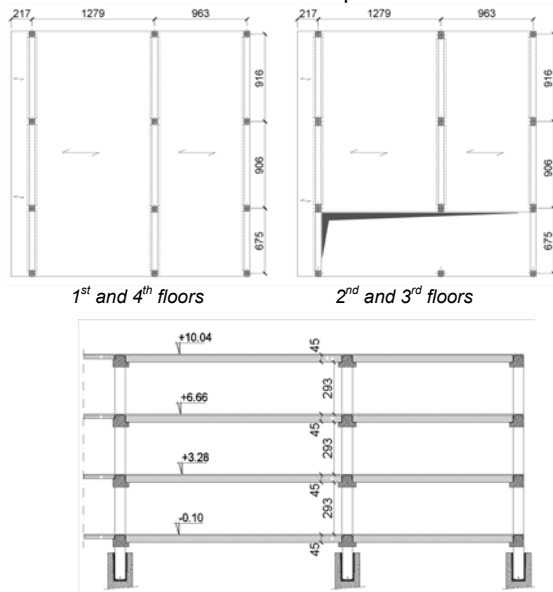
Plan and elevation view of an office building with Brooklyn suspended solution
